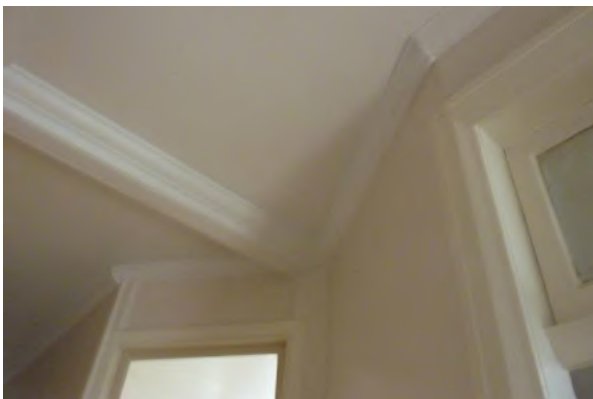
Ceiling of entry hall (G.1) showing beaded timber beam and cornices, lightweight concrete wall, finlights and architrave—56B / 46–56 Gloucester Street. (Source: GML Heritage, May 2015)
